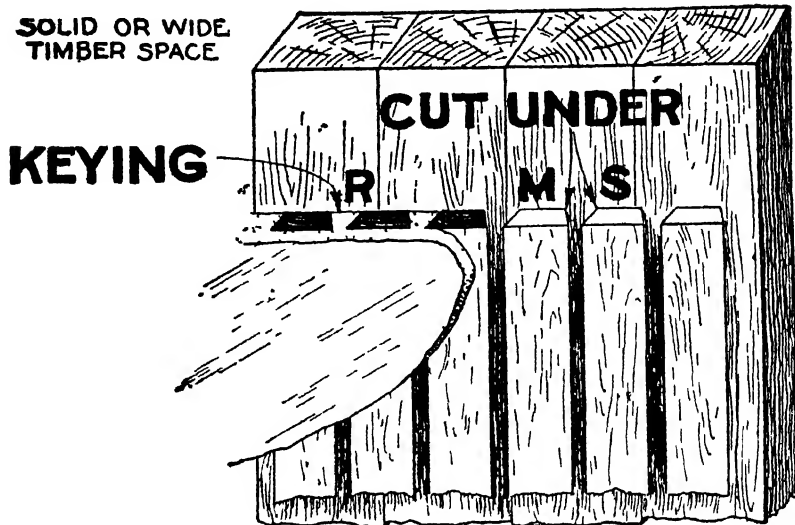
449 —Treatment of lath nailed to broad timber When the timber is over 2 ins wide the lath be cut under' as at M and S this provides for proper keying as at R
